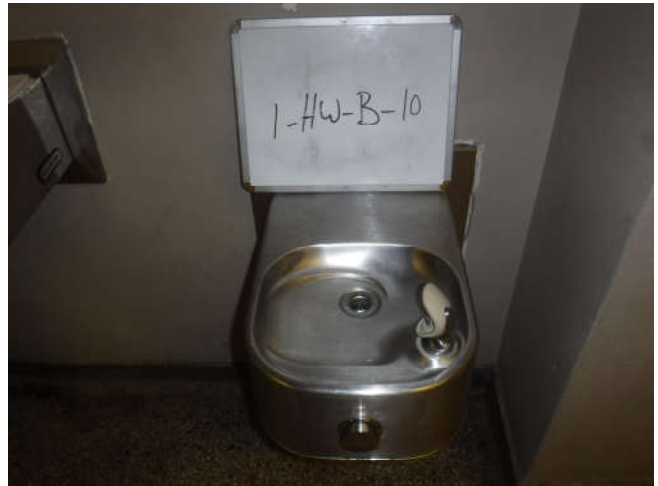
Bubbler, located on the 1st floor across from Rm 114 (right)
